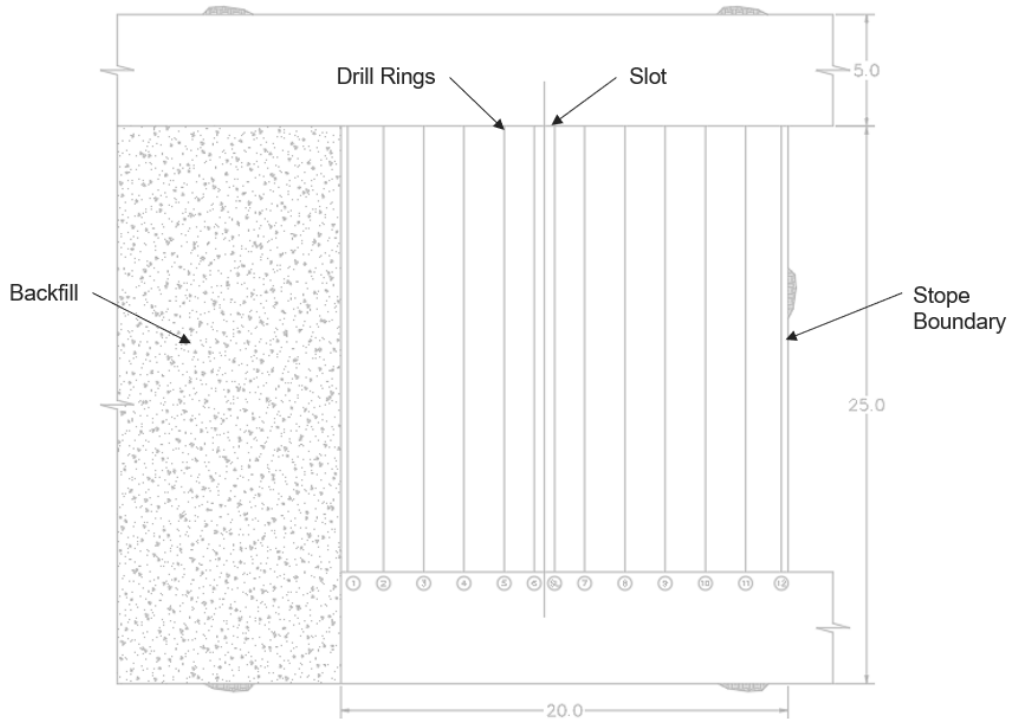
Typical Longitudinal Drill Ring Design Longitudinal View
